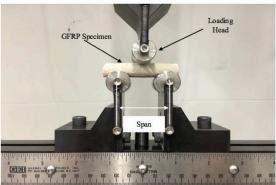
Horizontal shear test performed on GFRP bars extracted from Southview Bridge
